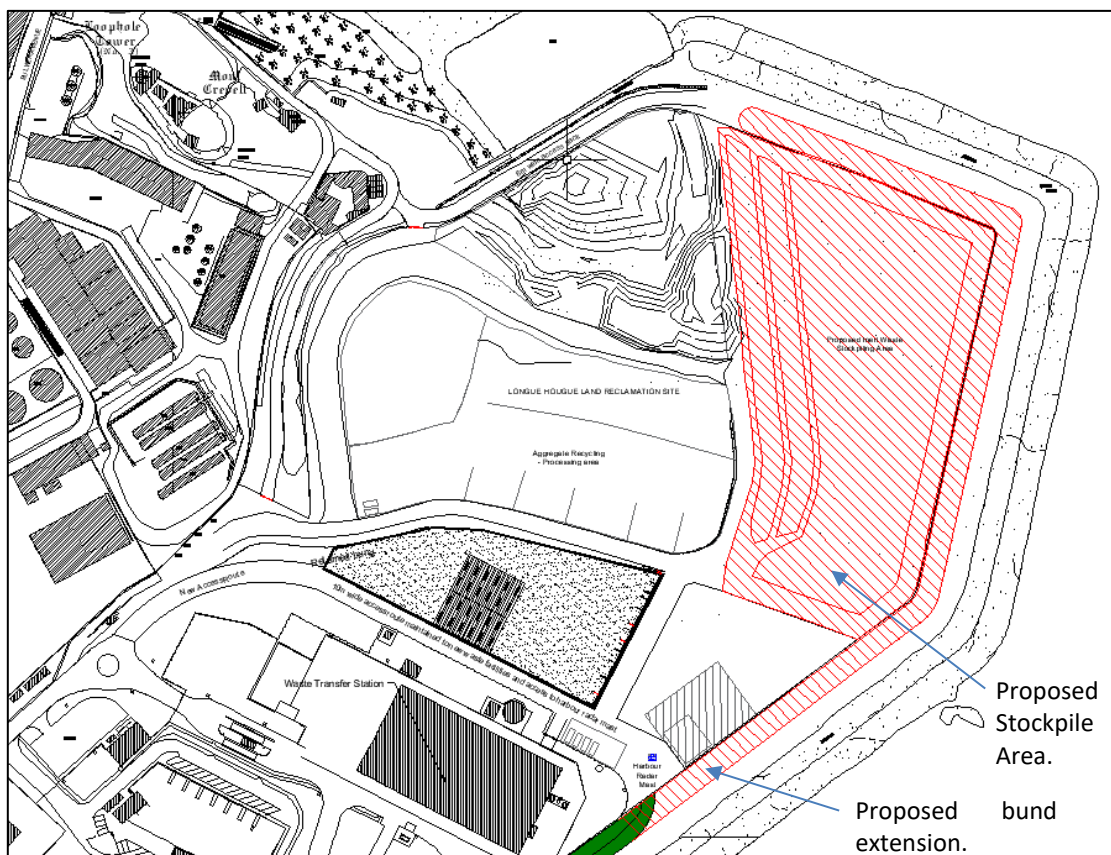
Proposed stockpile area and extension to perimeter bund (red hatch).
